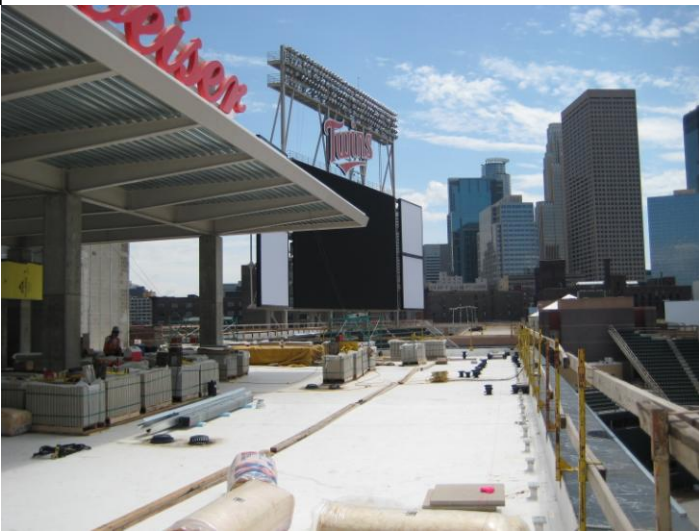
Budweiser Roof Deck walkway pads have been delivered
